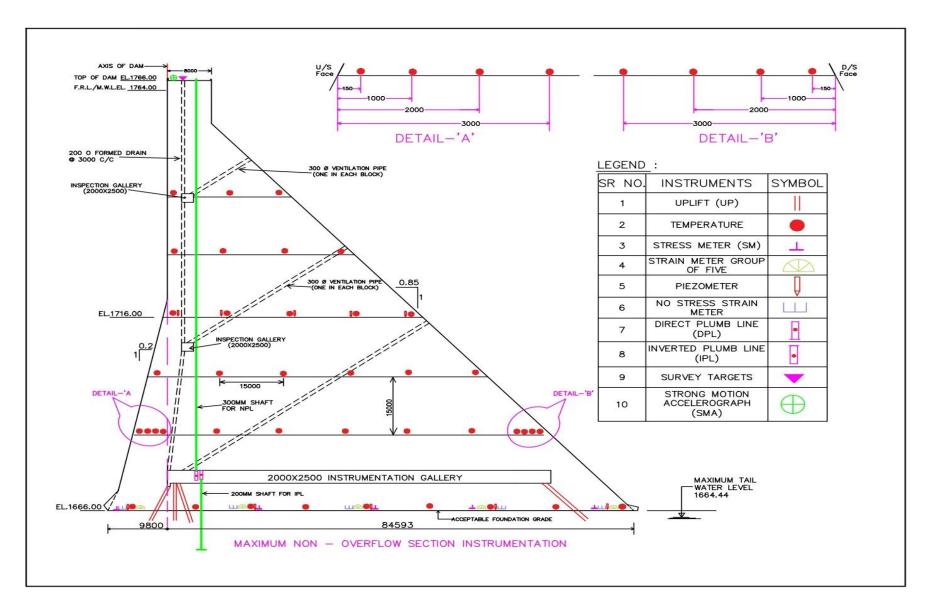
Typical Instrumentation Plan for Gravity Dam
